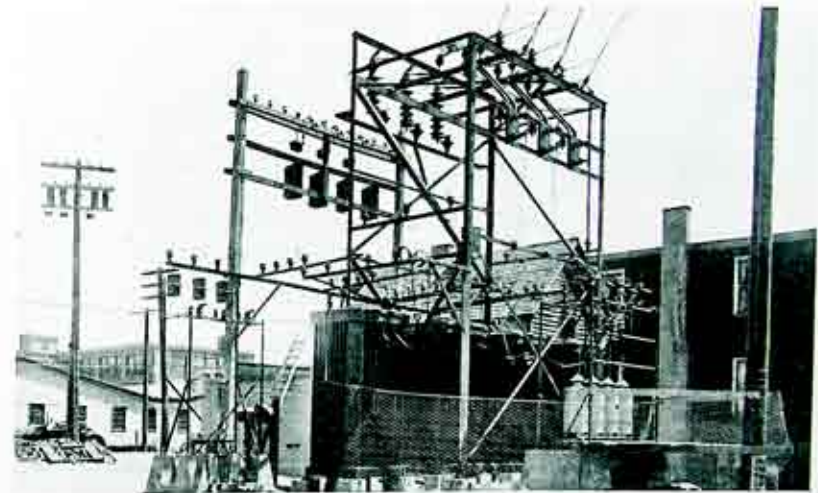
New up-to-date outdoor substation recently installed at East Rochester. The wire netting was only temporary. The ground has been graded and an iron fence now surrounds the structure.
